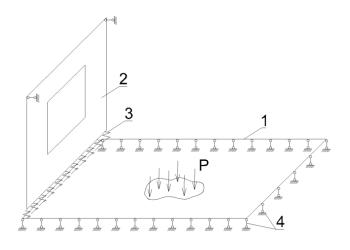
The connection of the floor slab with a hanging outer wall panel
